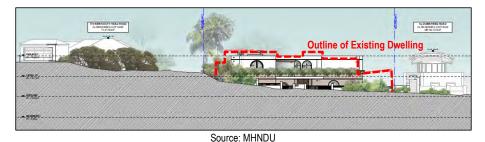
East Elevation Showing the Proposed East Wing in the Streetscape
